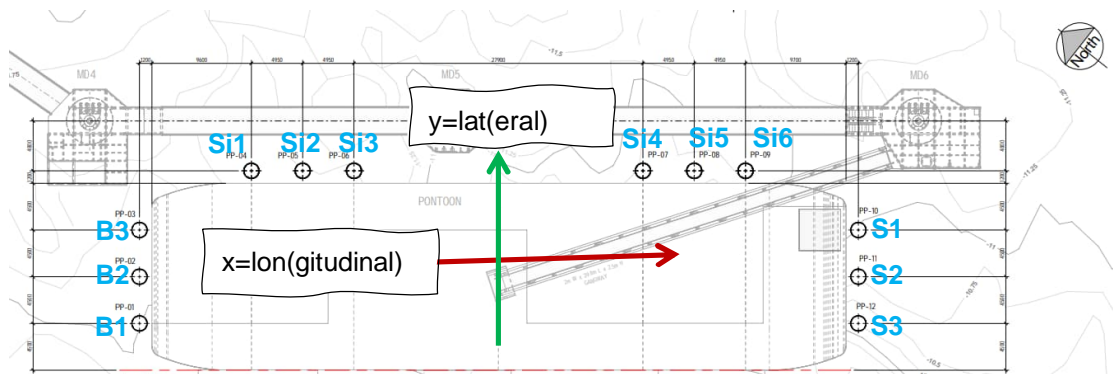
Schematical plan view of access berth, B=bow, S=stern, Si=Side
